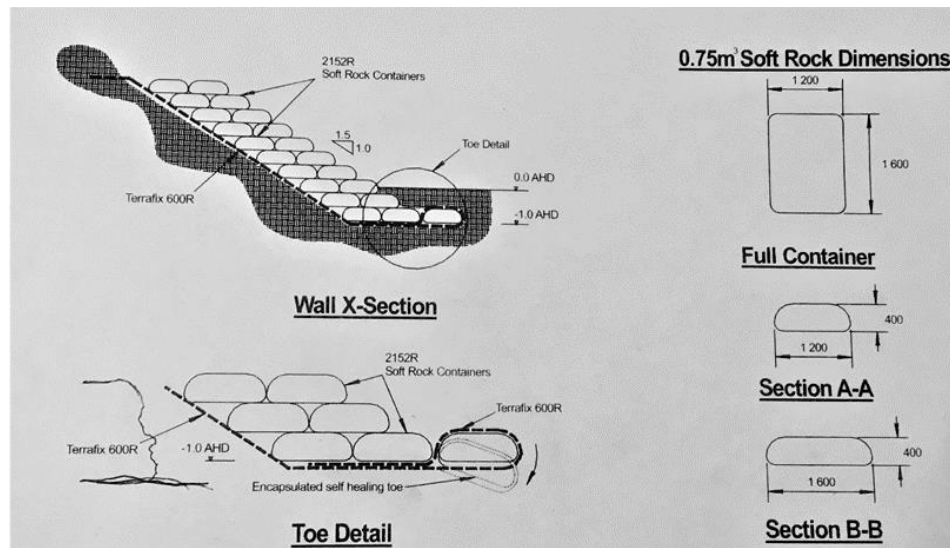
Standard Construction Drawings for Sandbag Seawall prepared by Soil Filters Australia
